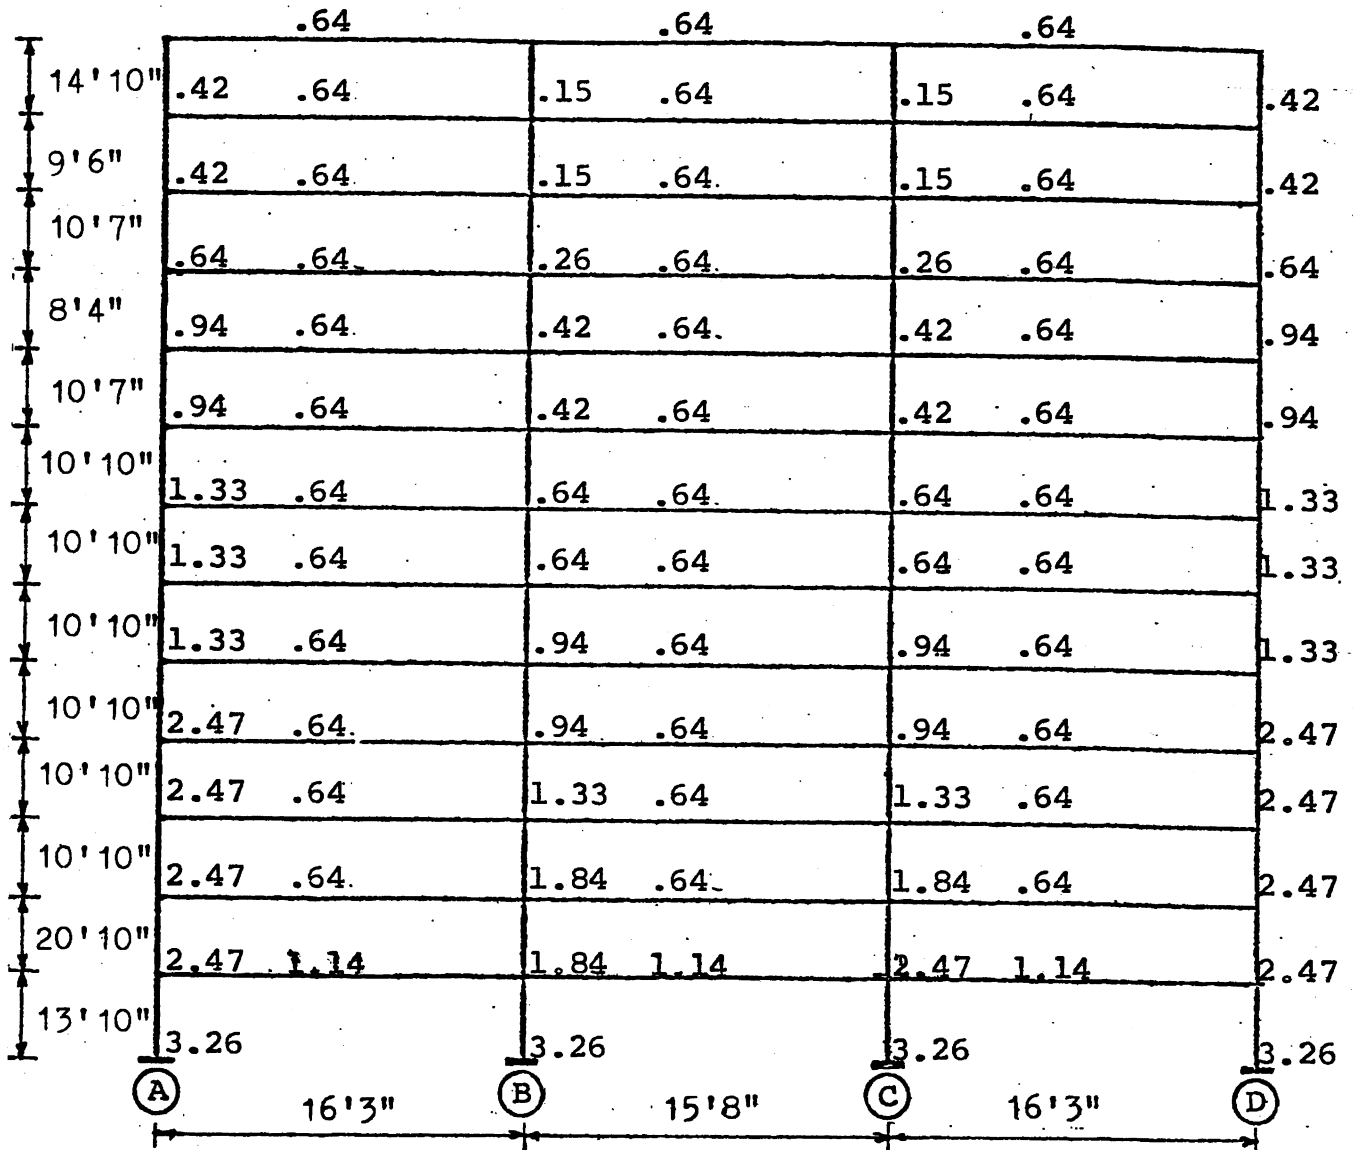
Selected Frame in Building 2 with Moments of Inertia for Beams and Columns, (ft⁴)
